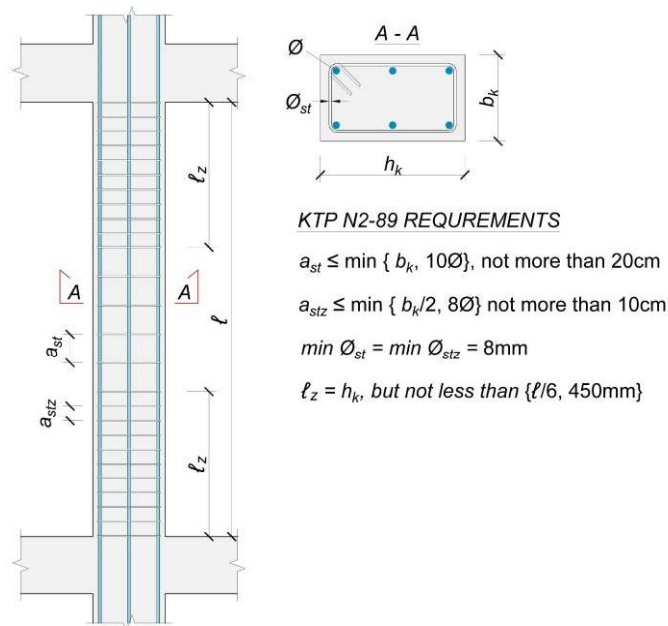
Basic requirements column detailing referring to KTP N2-89
